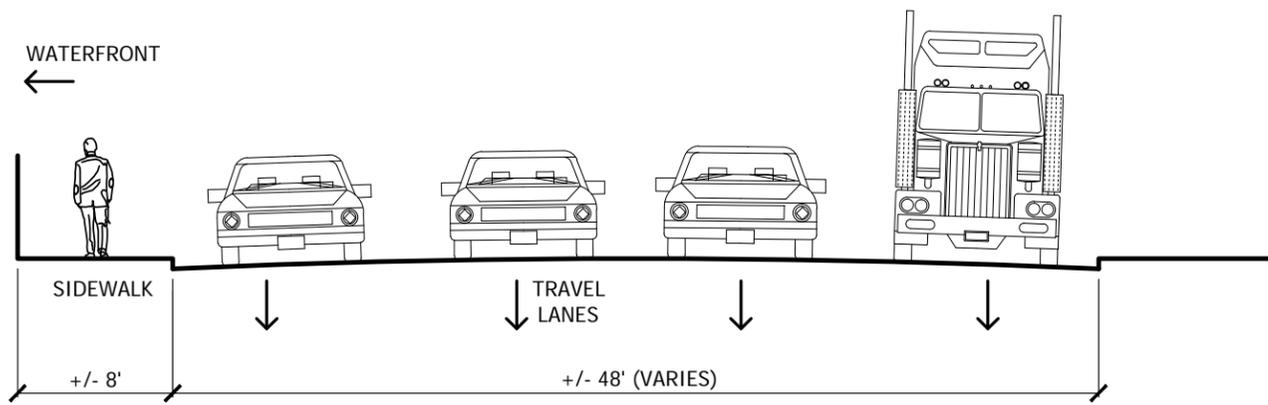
Existing configuration on Hamilton Avenue from Smith Street to 21st Street
